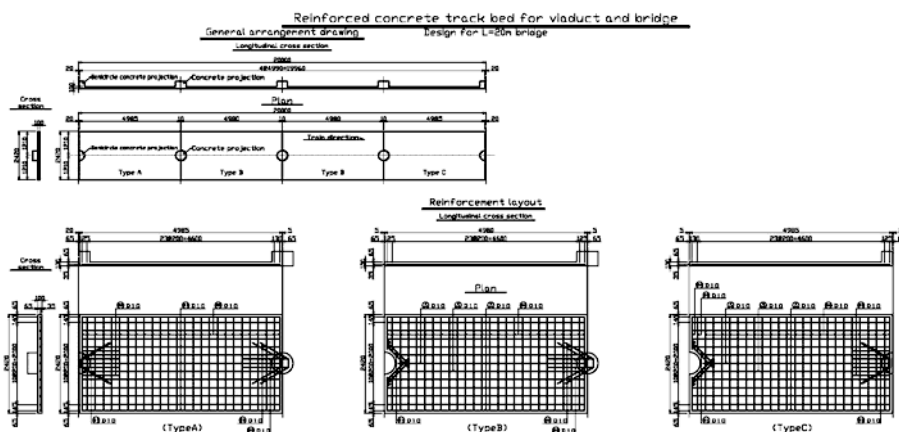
Reinforced Concrete Track Bed (Viaduct/Bridge Sections)
